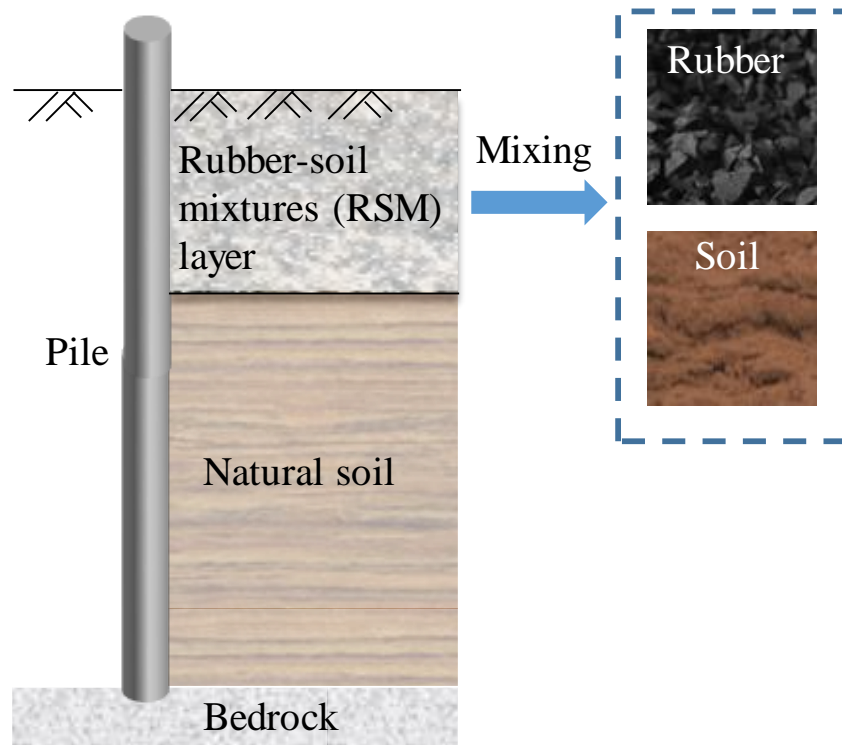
The pile foundation using rubber-soil mixtures (RSM) layer
